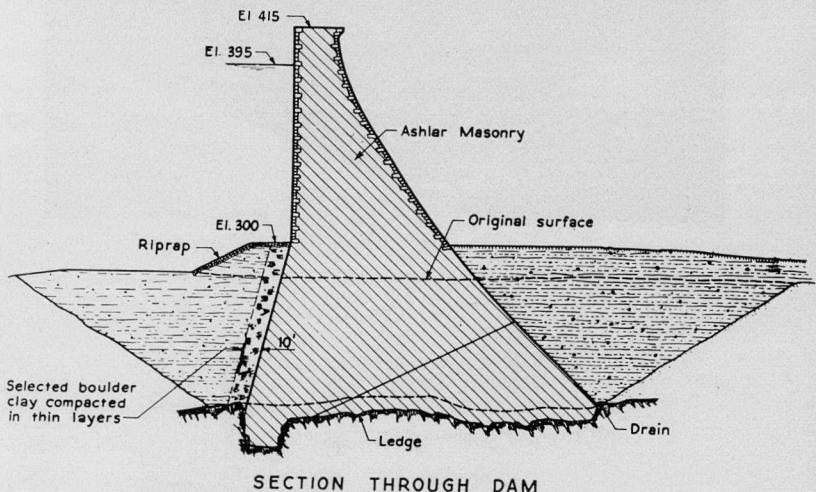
WACHUSETT DAM AND DIKE CROSS-SECTIONS, 1900
